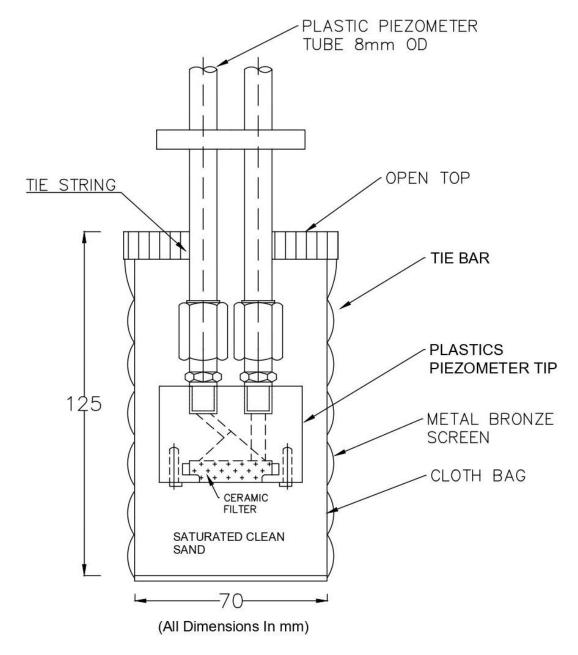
FOUNDATION TYPE PIEZOMETER ASSEMBLY
